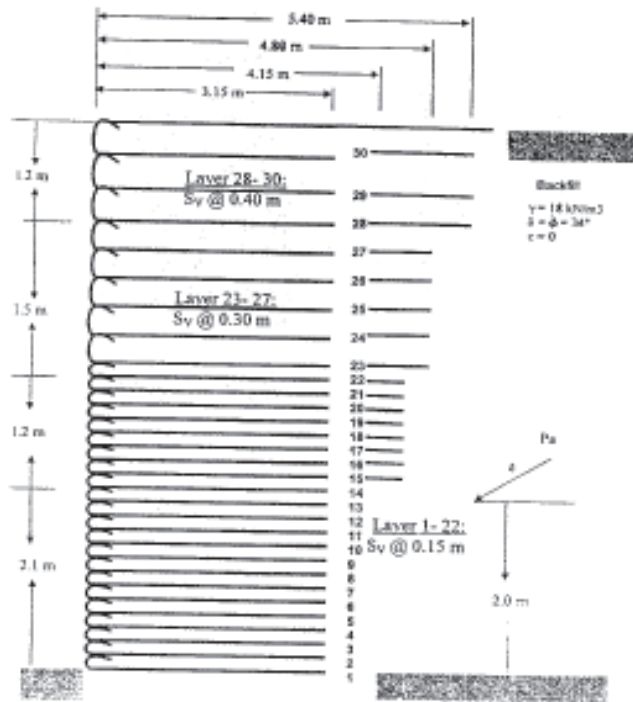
Outcome design of a 6.0 m high wall using treated DW Twill JGT filter behind a retaining wall
